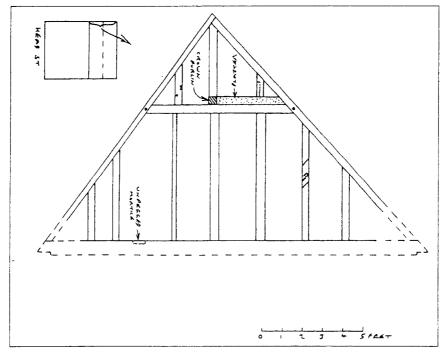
A medieval roof in Head Street, Colchester - End Truss
